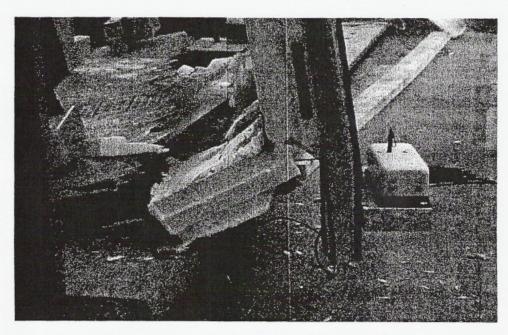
Closeup of Failure of 8' OSB-OSB Panel Under Compressive Loading
